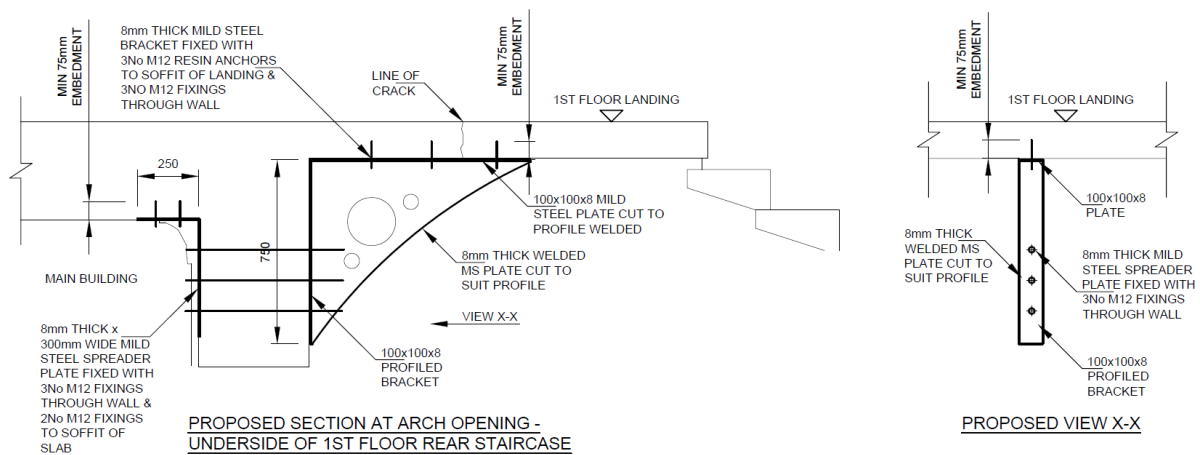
Proposed Section and View at Arch Opening – underside of the first floor 'Back Staircase'.
